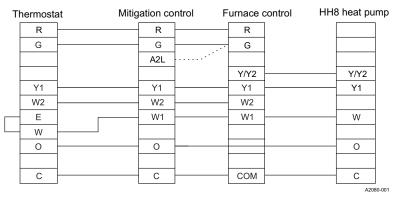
Control wiring diagram - standard ECM gas furnace and HH8 heat pump
